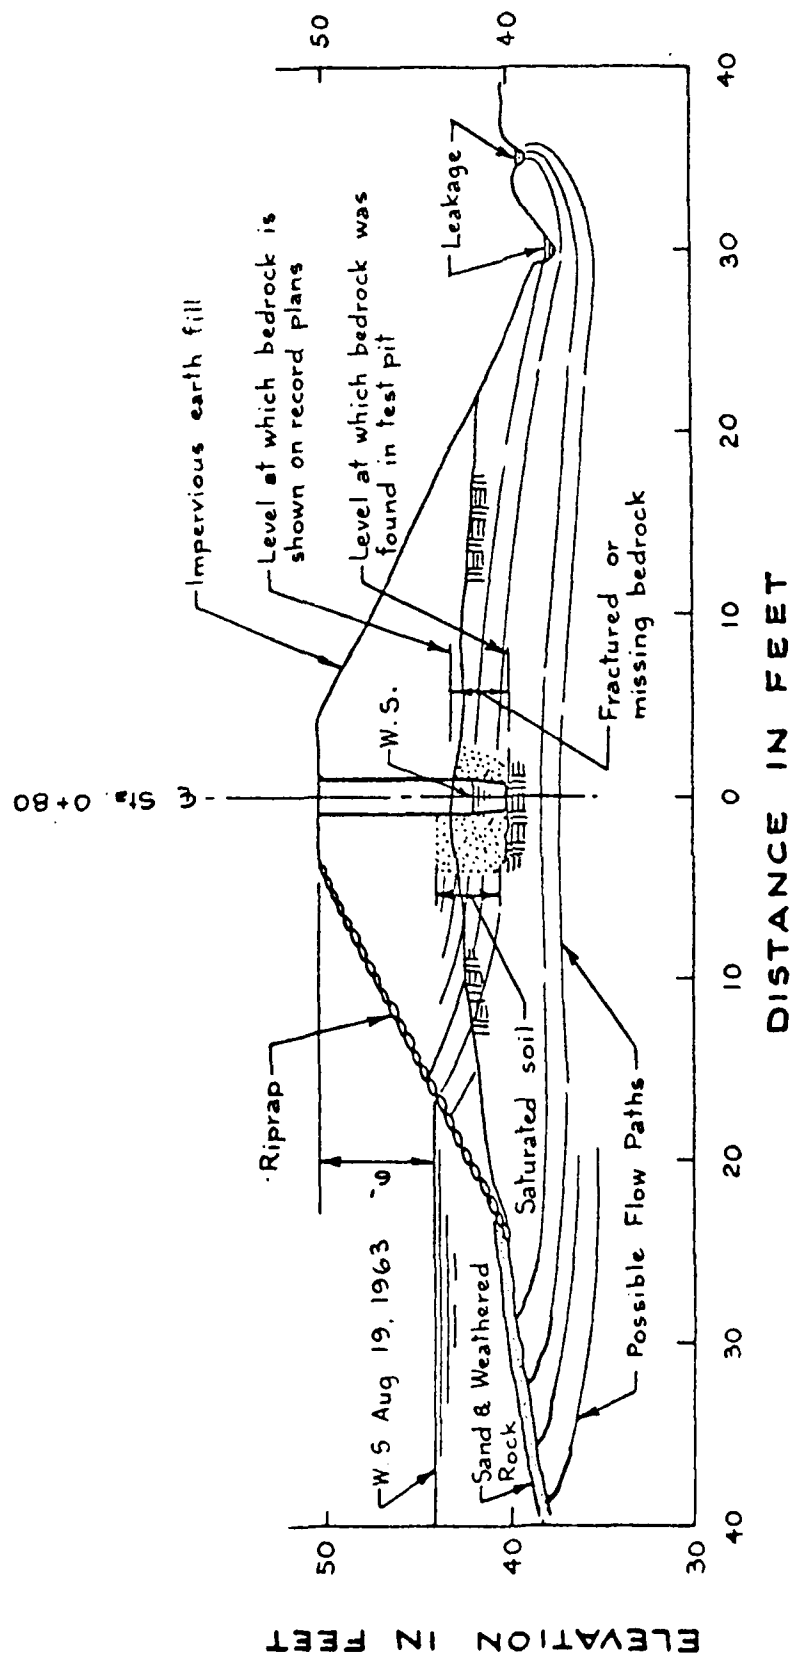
TEST PIT NO.3 - AUGUST 17, 1963
